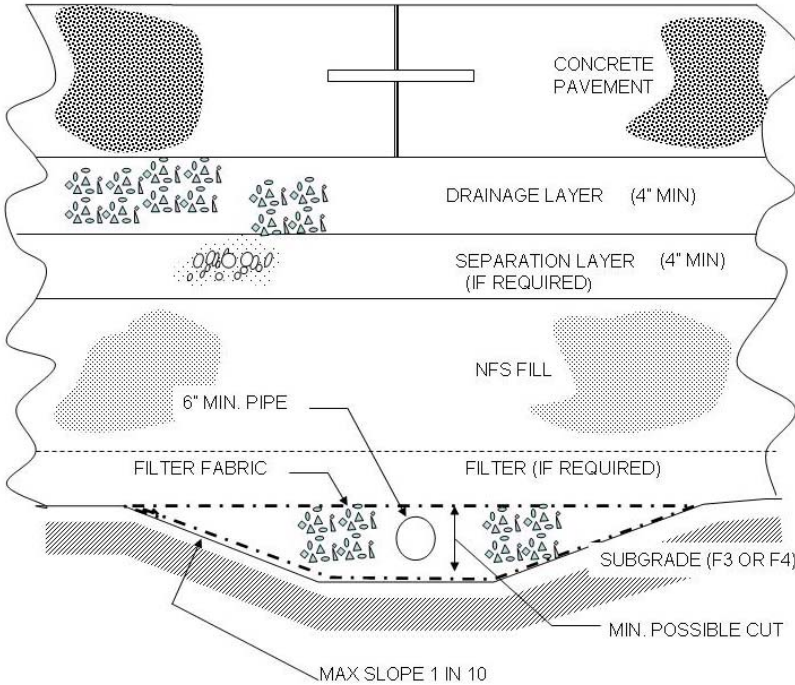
Typical Interior Subdrain for Rigid Pavement
